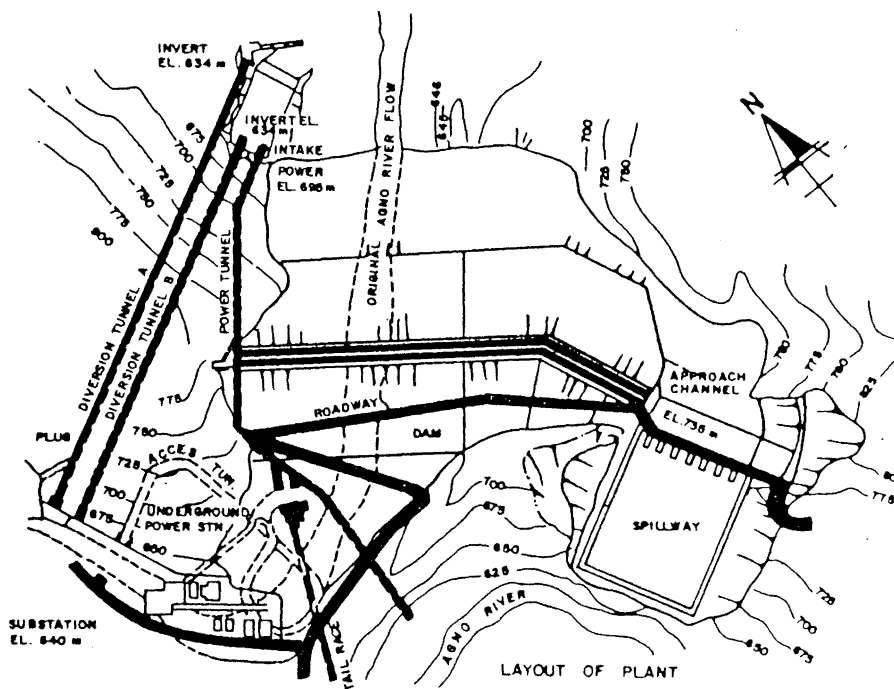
Ambuklao Hydroelectric Plant - layout
